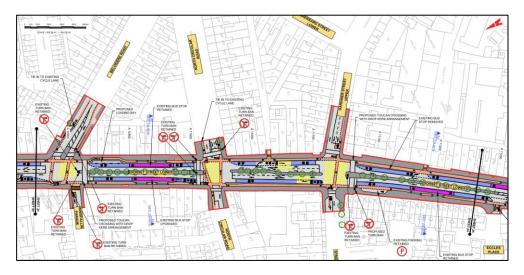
Extract from General Arrangement Drawing (Sheet 34)
